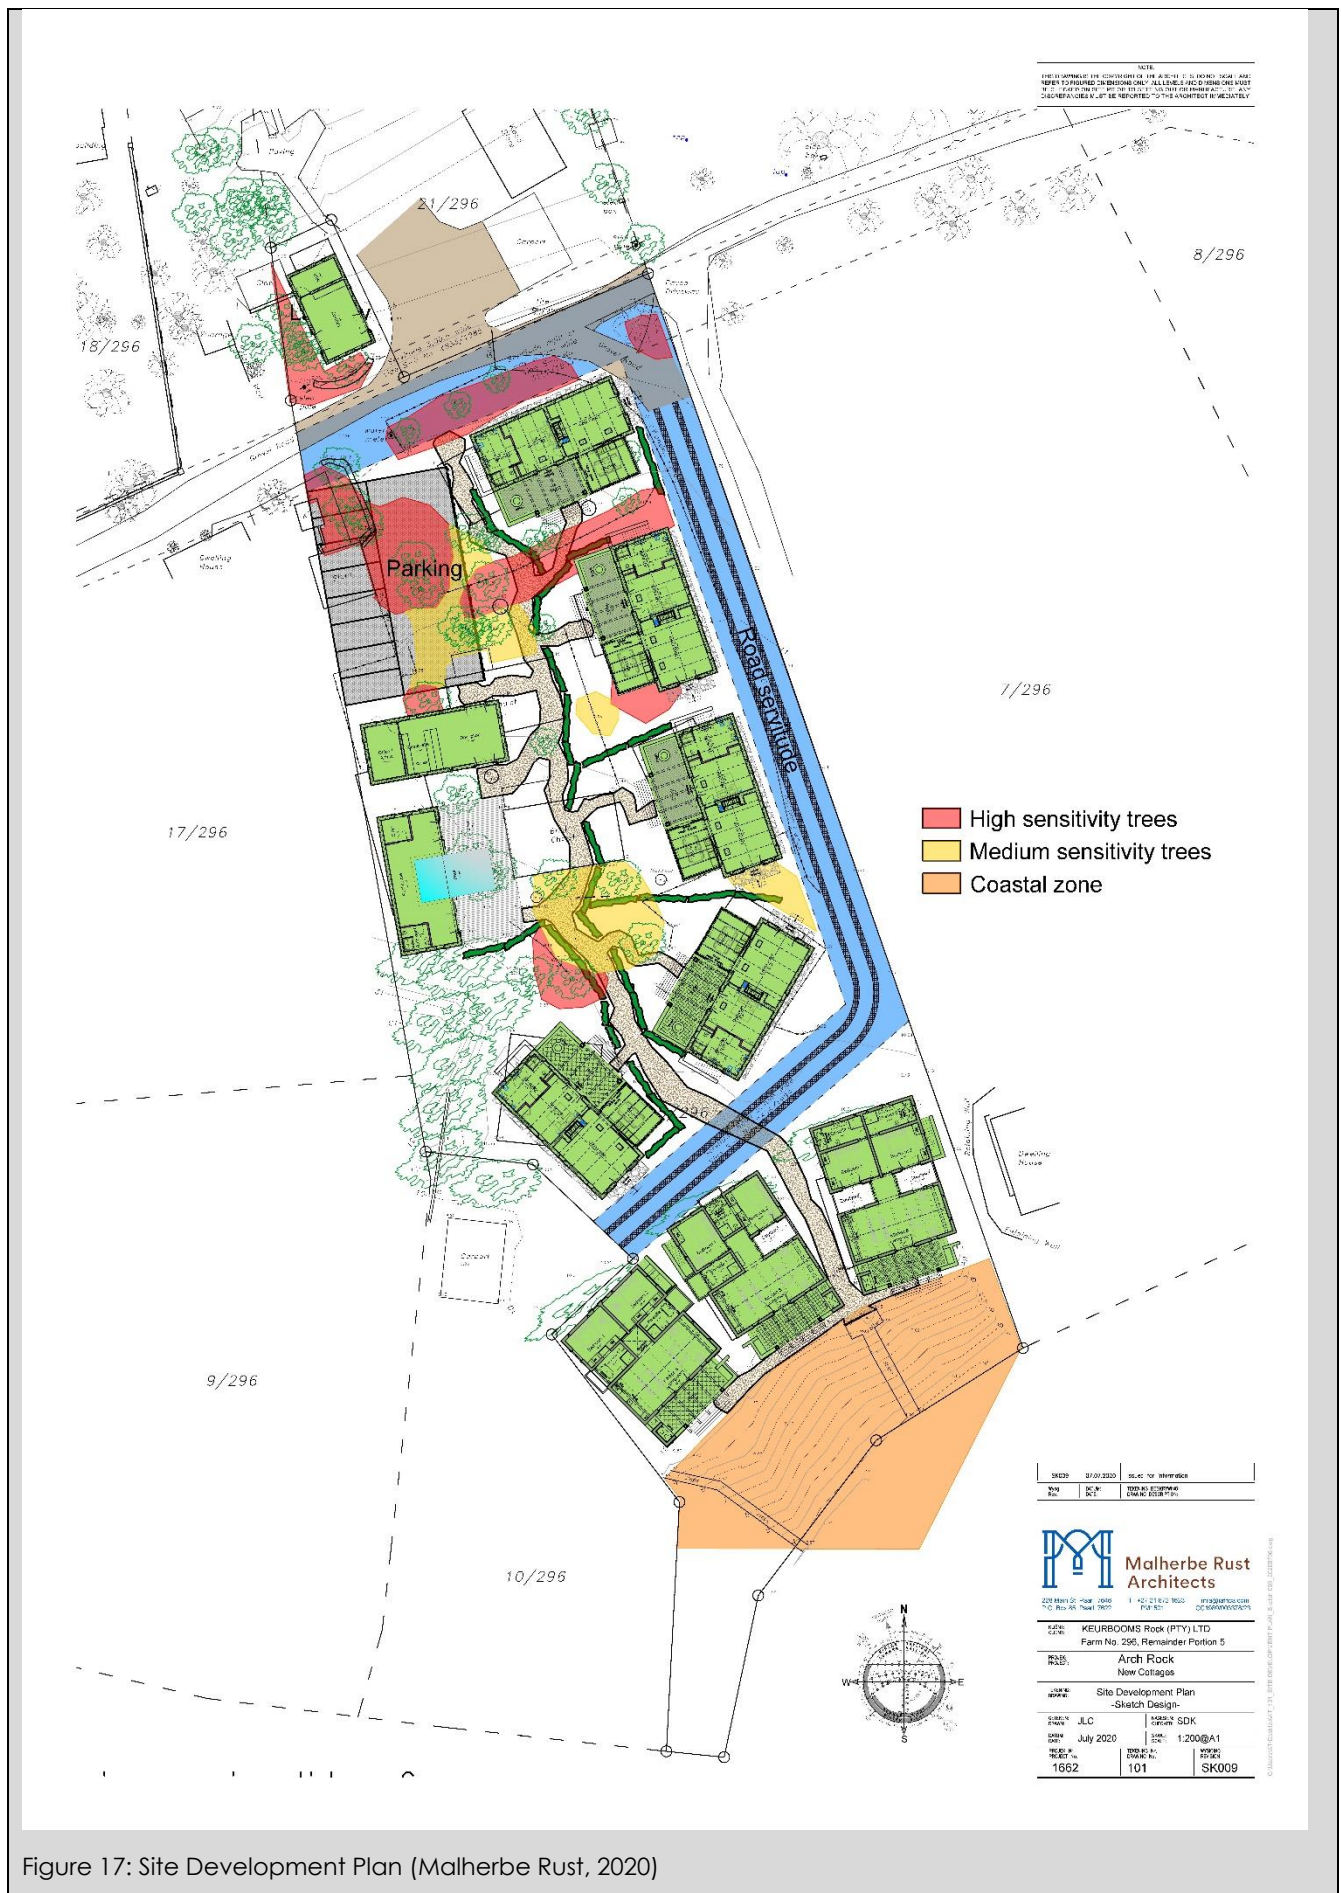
Site Development Plan (Malherbe Rust, 2020)
